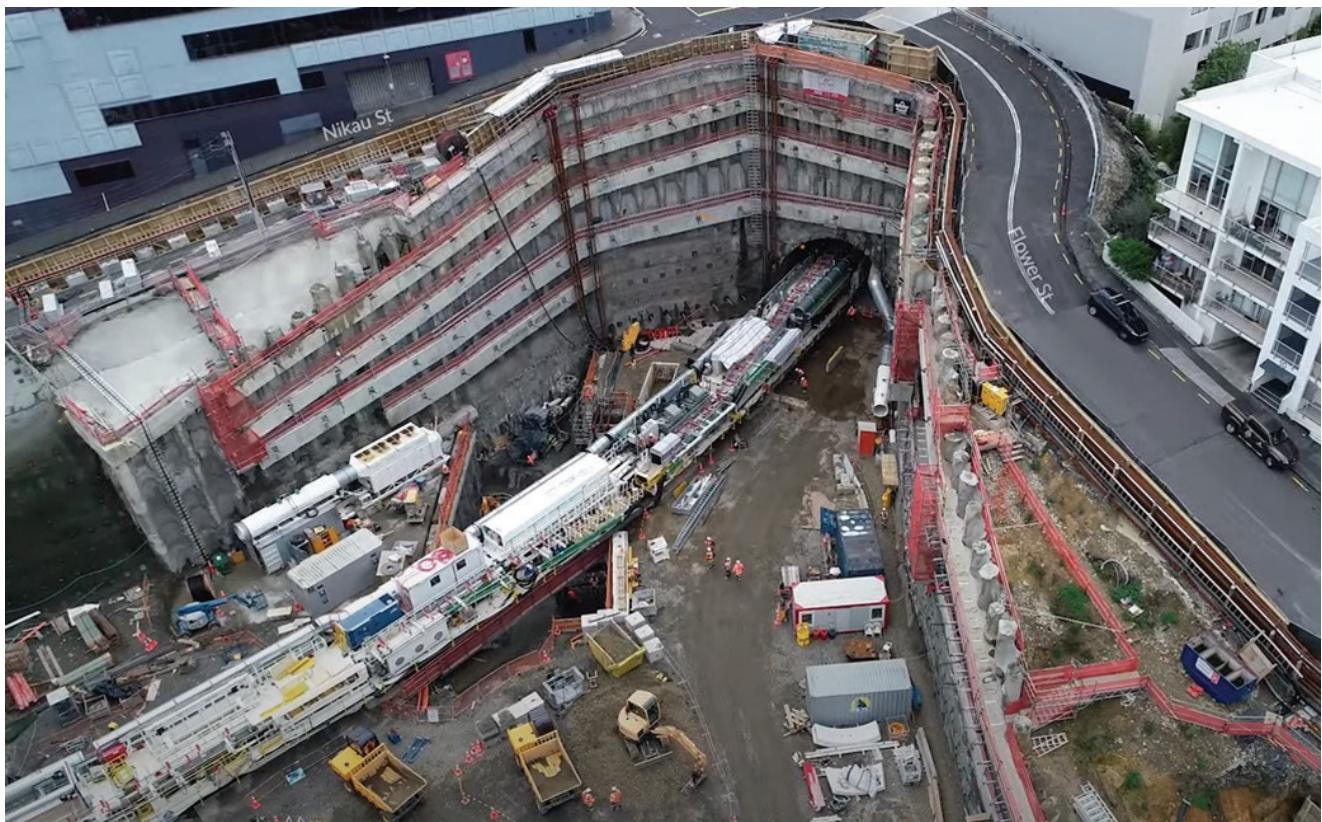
Mt Eden tunnel portal temporary retention structure with TBM Dame Whina Cooper in foreground.
